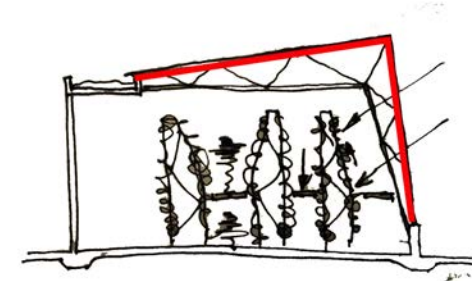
Greenhouse section sketch 8 (Author 2018)
